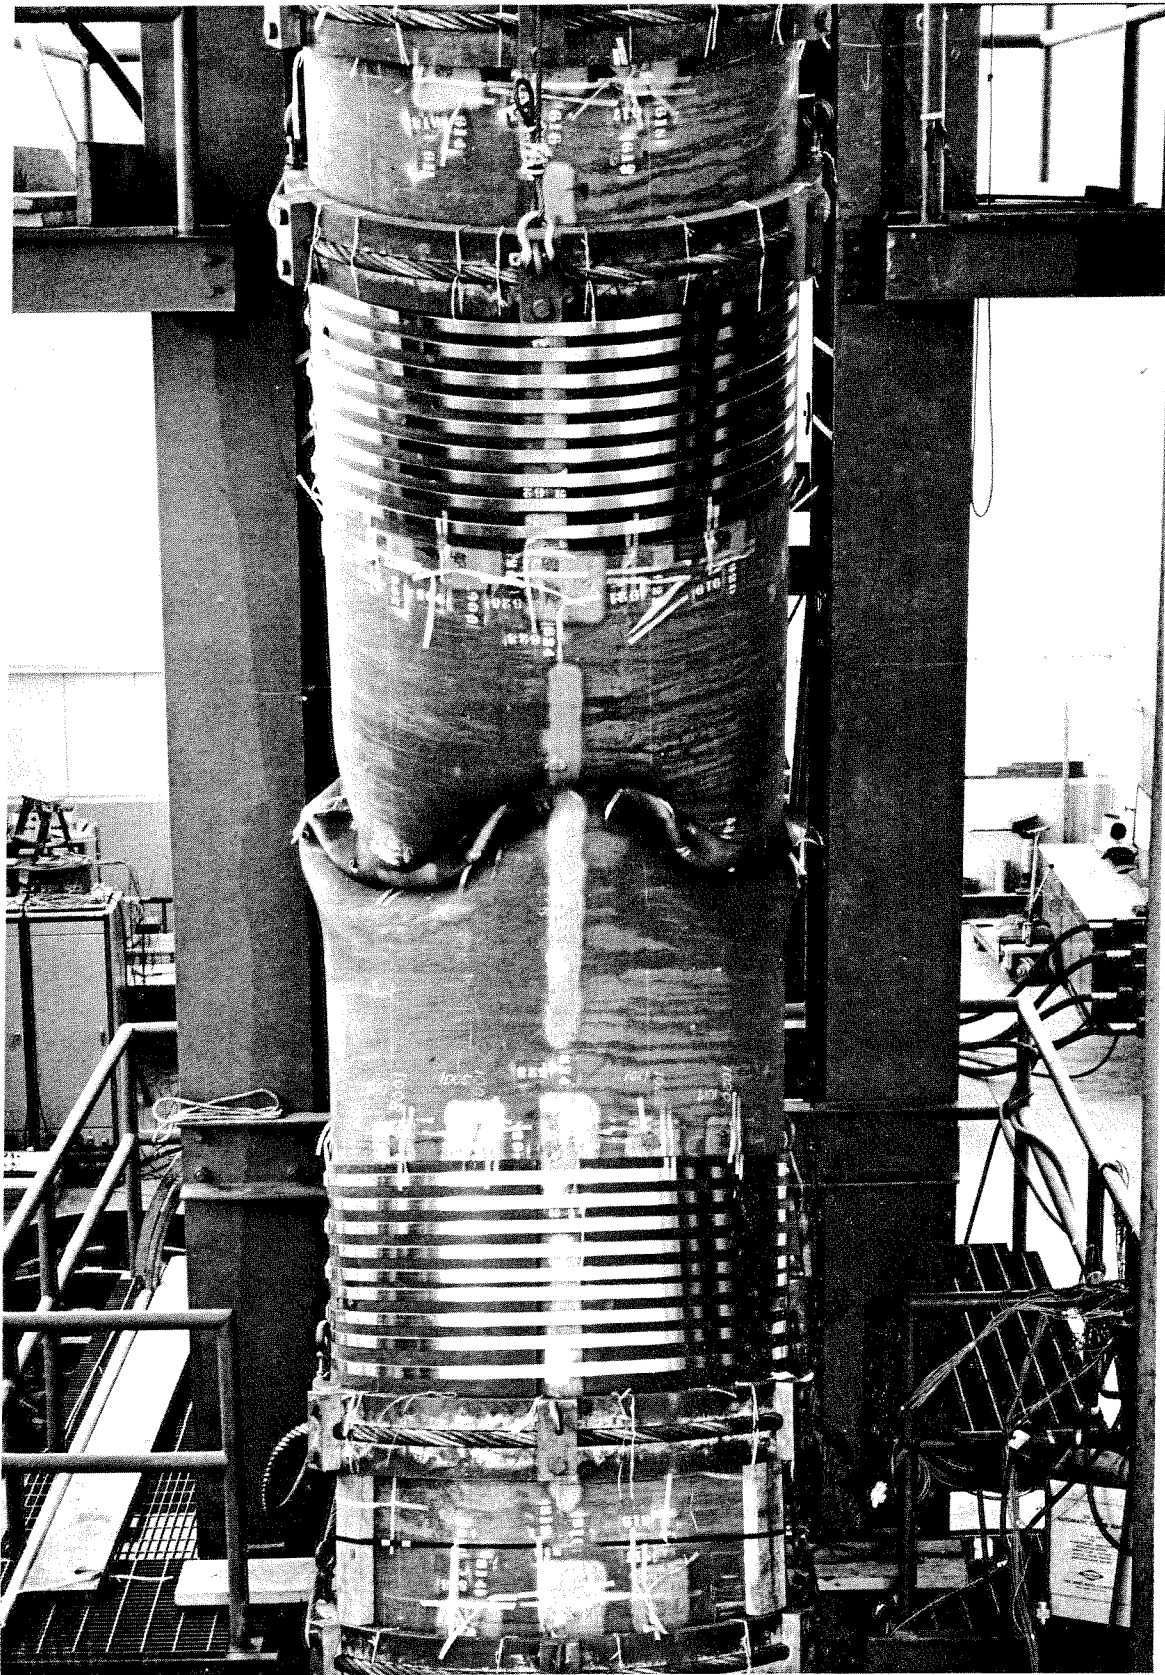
SPECIMEN NO. 6 GENERAL VIEW AFTER POST-BUCKLING TEST
